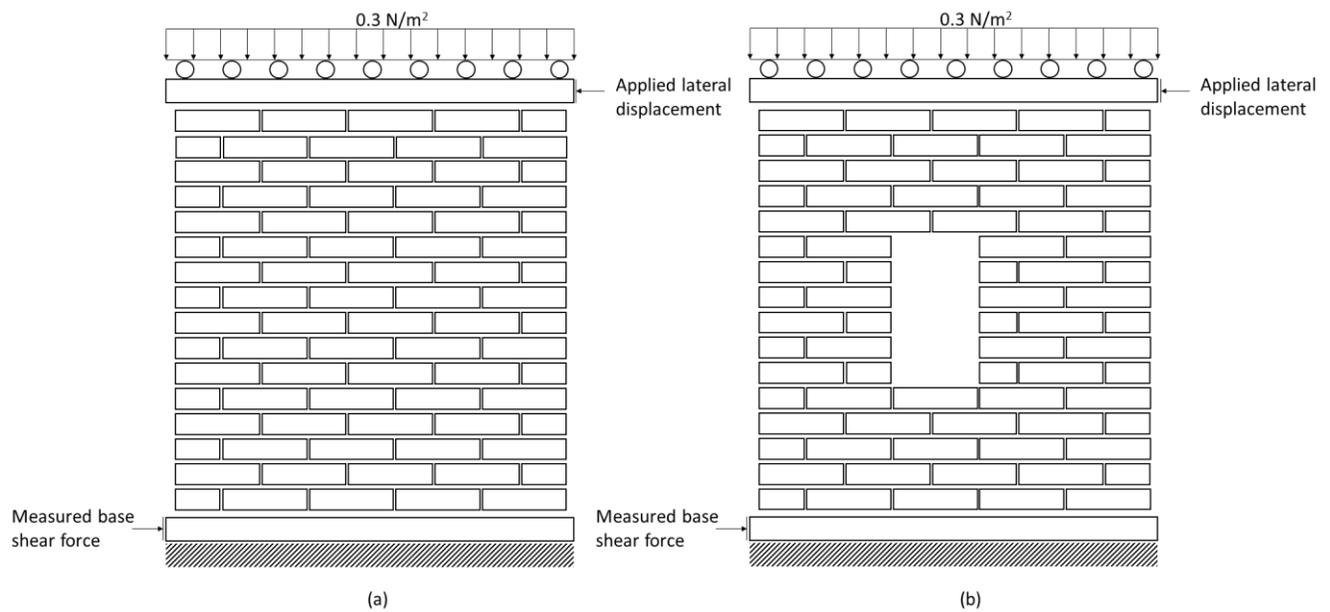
(a) Shear wall without an opening, (b) Shear wall with opening
